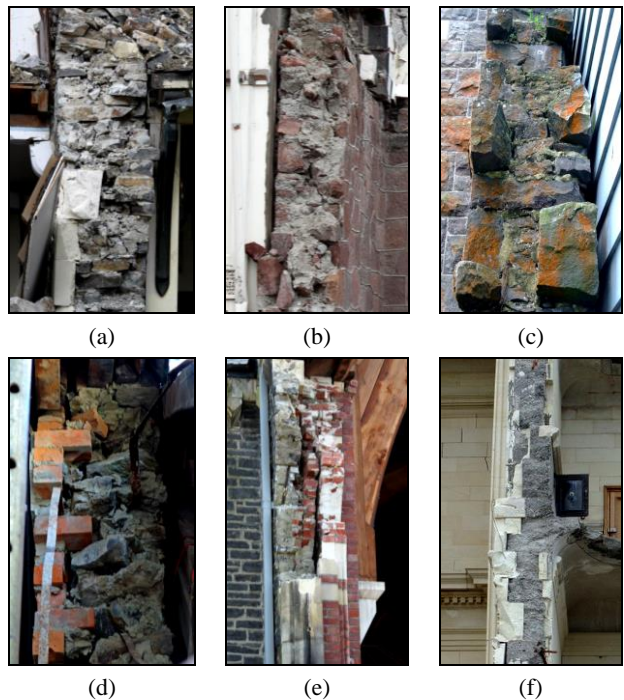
Typical unreinforced stone masonry cross-section in New Zealand. 3 leaves with rubble fill in (a) the Trinity Church and (b) the Provincial Chambers towers, Christchurch; (c) 3 leaves with headers in St Paul's Church, Auckland; stone front façade with clay brick back leaf in (d) Bellamy's and (e) St Luke's Church, Christchurch; (f) stone facing with cast in-situ no-fines concrete core in the Cathedral of the Blessed Sacrament, Christchurch.
